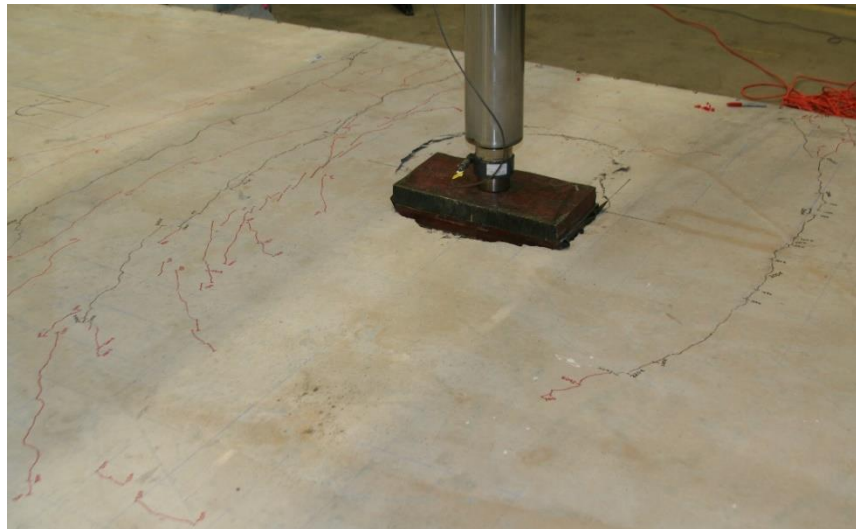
SFRC Bridge Deck Failure Due to LP1
